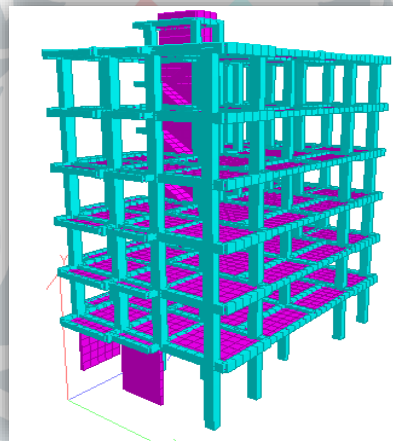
STAAD-PRO model of the building with shear wall in ground storey
